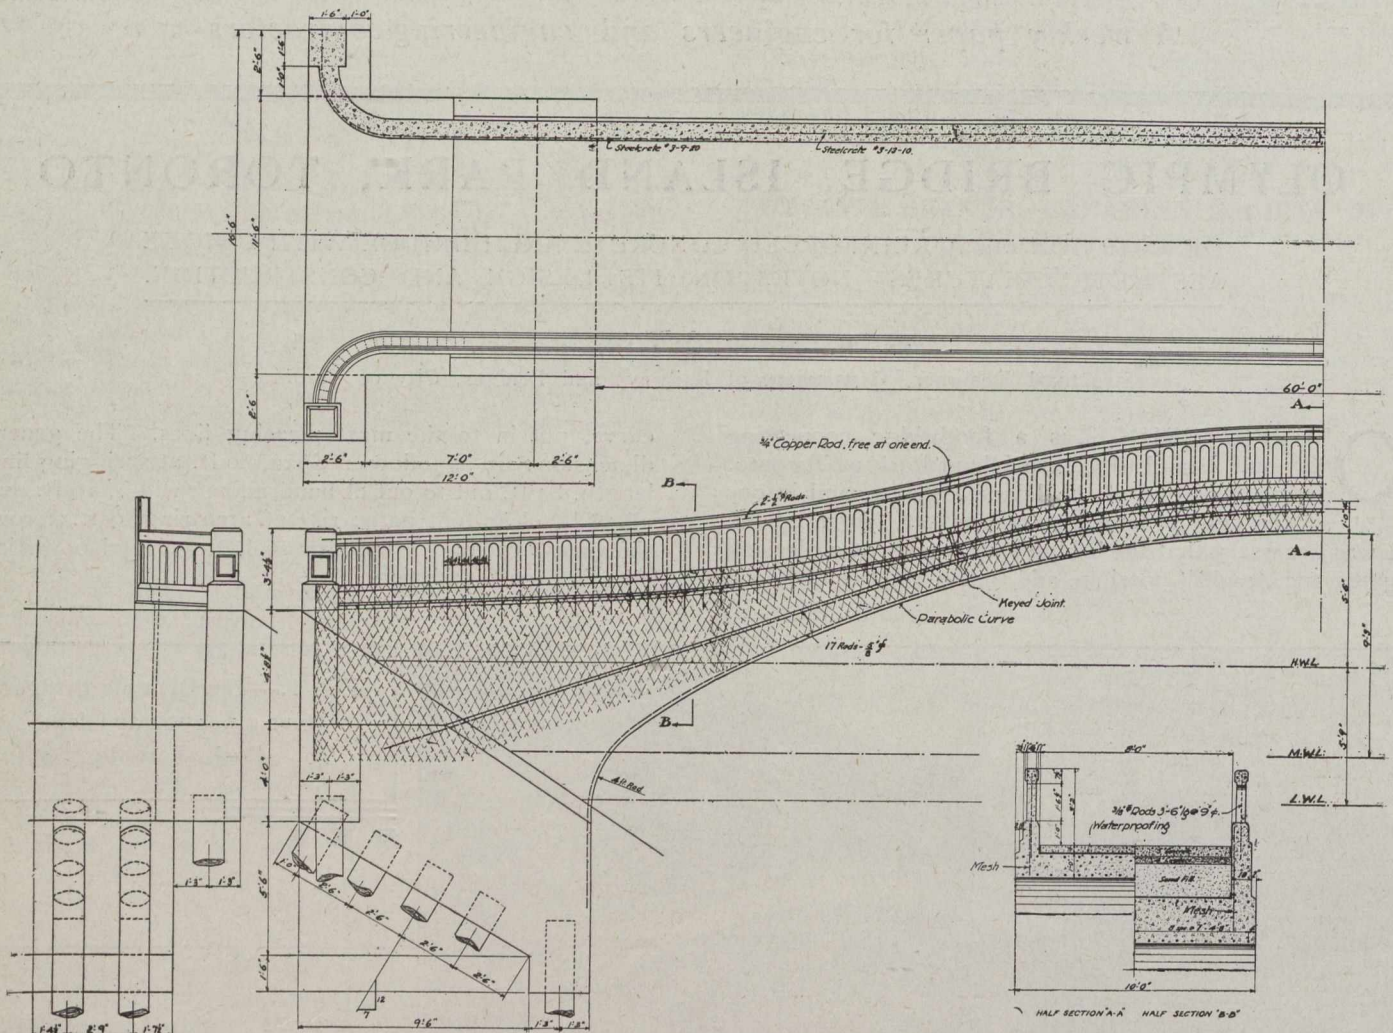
Details of Arch Rib, Spandrel Walls and Abutment.
